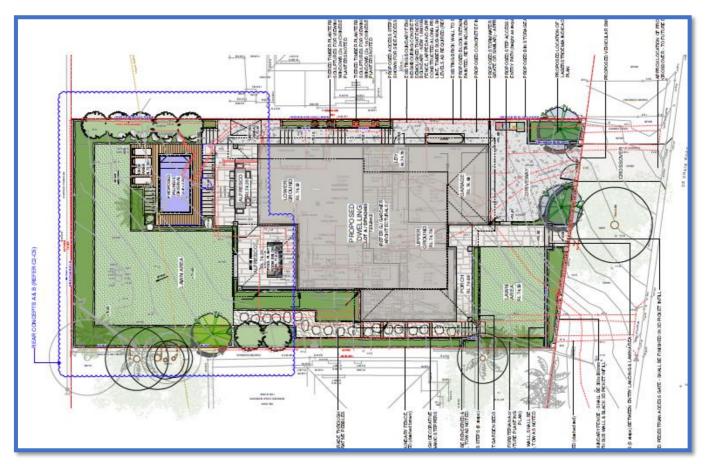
Proposed landscaping plan with rear yard swimming pool.
